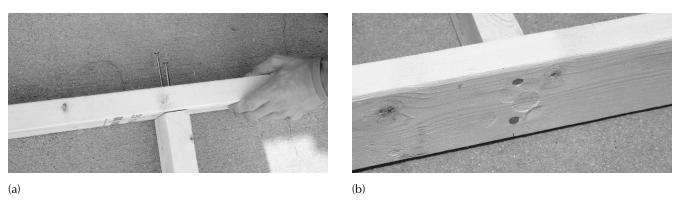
(a, b) Sstandard method of nailing shoe and top plate to the studs.
